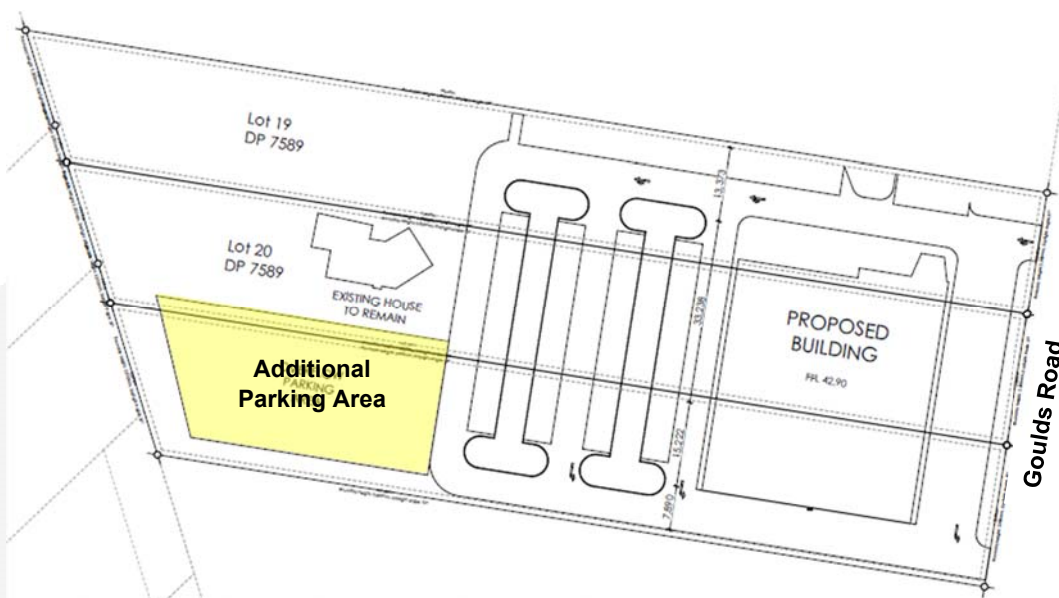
Additional Parking Area (Extract from Whimbrel Drawing)
